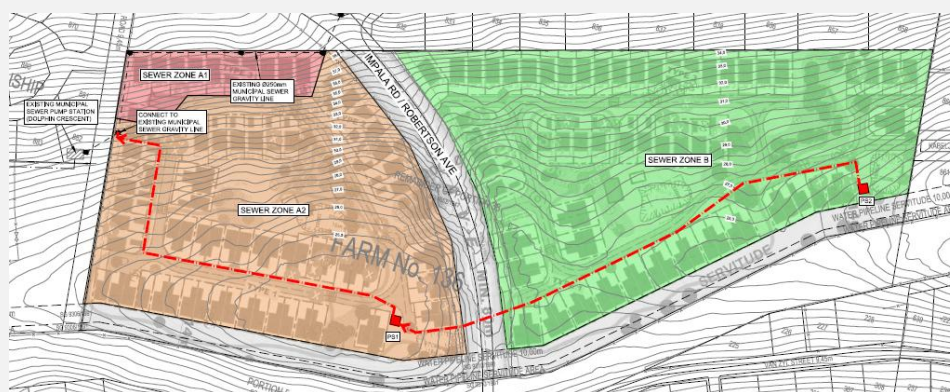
Proposed bulk sewer connection and internal sewer design and internal pump stations (Element Consulting Engineers)
